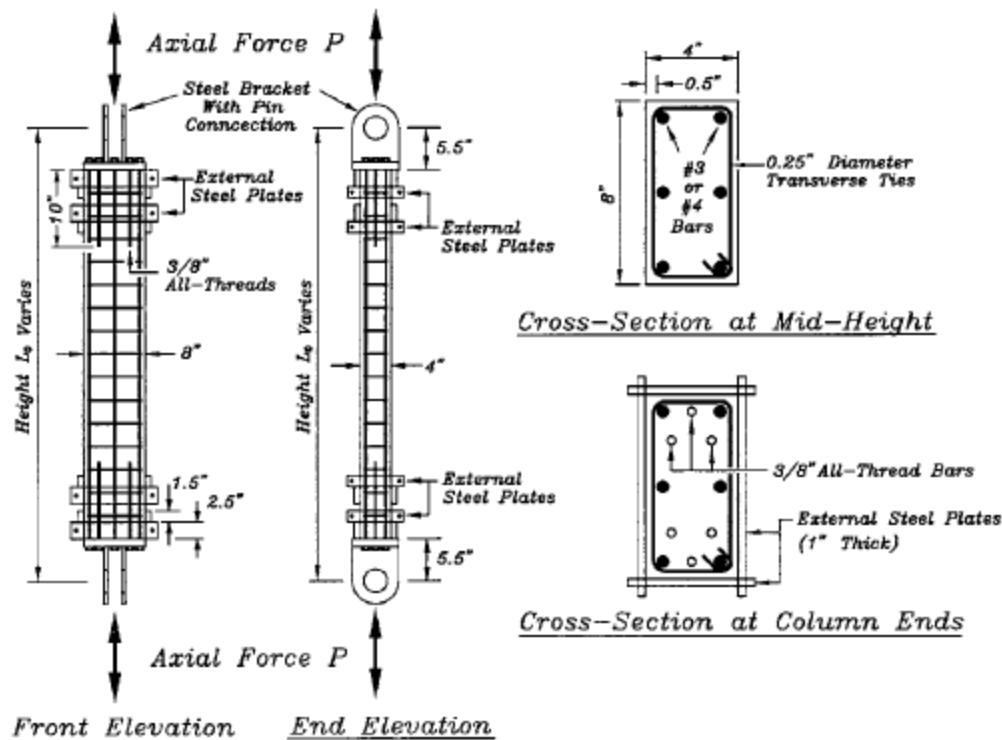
Reinforcement details for test specimens by Chai and Elayer (1999) (1 in. = 25.4 mm).
